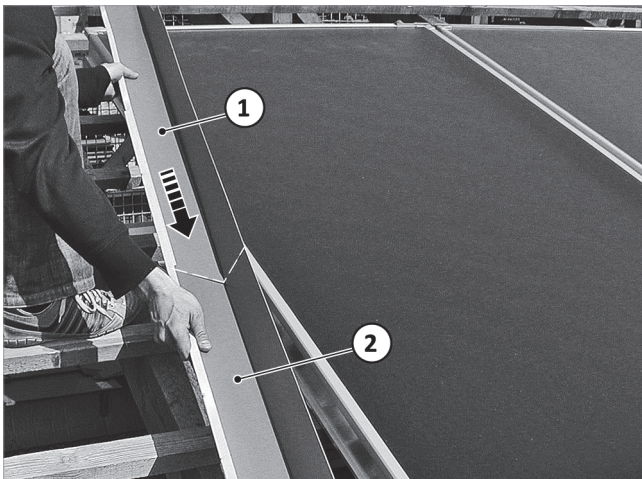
Slide the upper part of the side flashing over the lower part of the side flashing.
